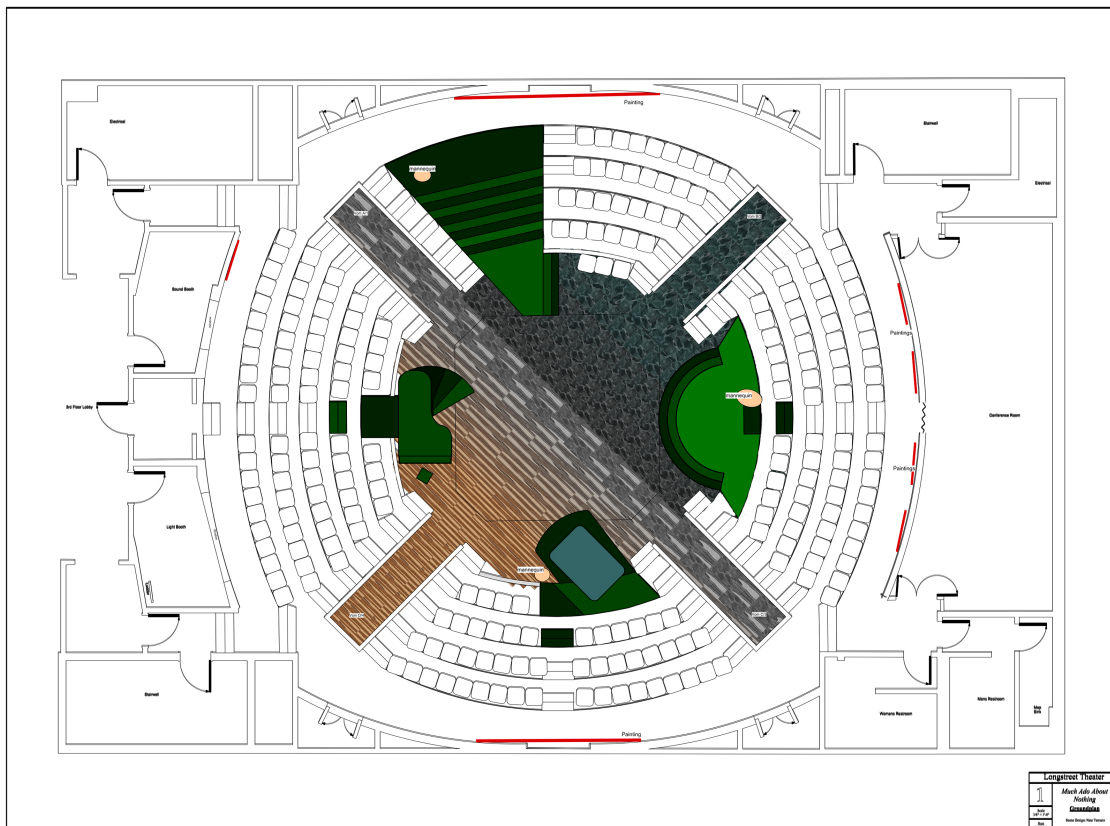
Much Ado About Nothing* ground plan with scenic floor option 2.
